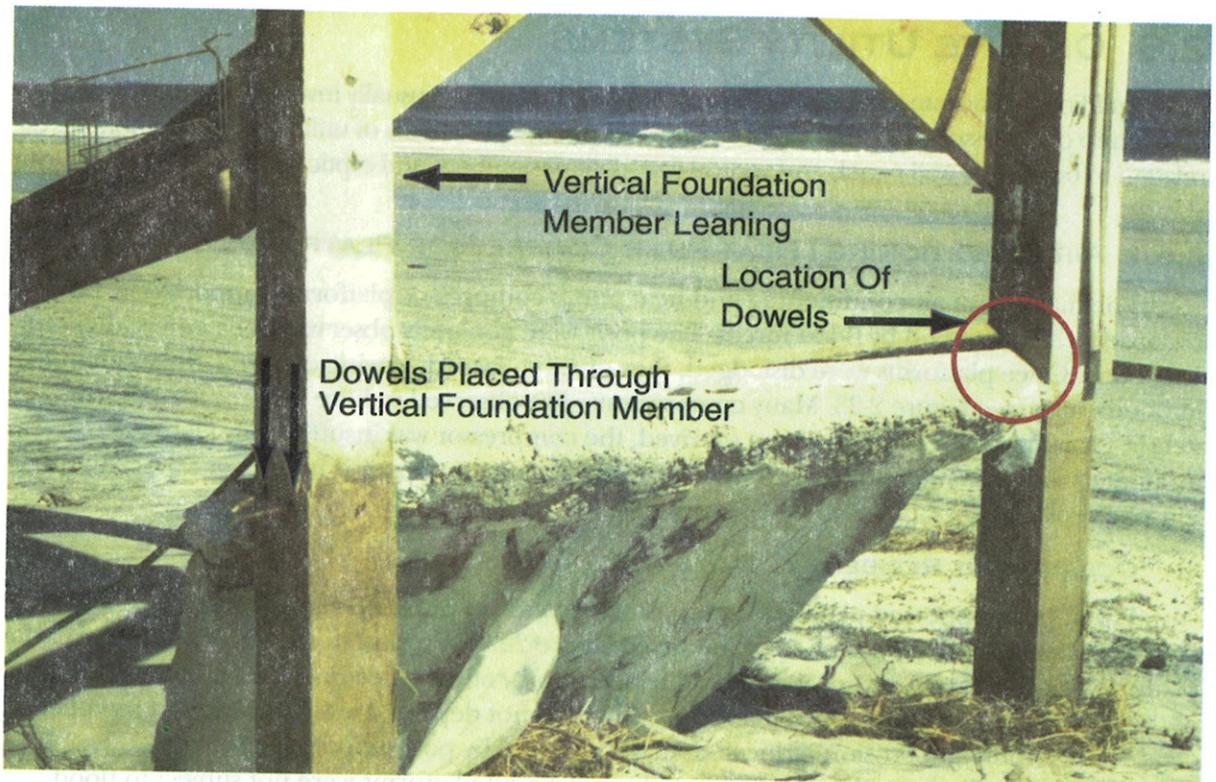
Use of steel dowels to tie slabs to vertical foundation members prevented the proper breakup of slab. A portion of the slab was left attached to the piling, resulting in large, unanticipated loads on foundation members. Note leaning vertical member, on right.
